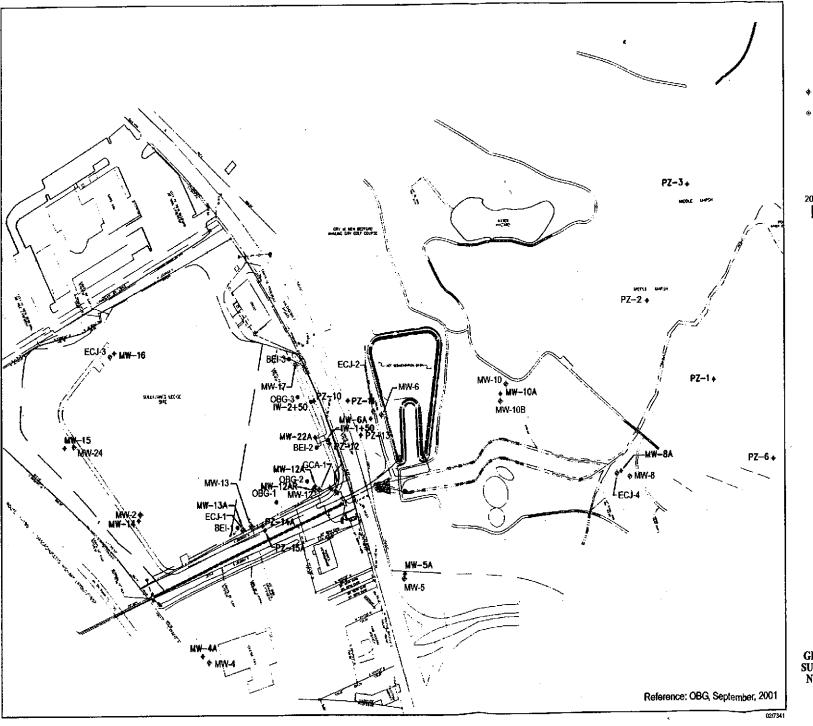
SITE PLAN SULLIVAN'S LEDGE SUPERFUND SITE NEW BEDFORD, MASSACHUSETTS
